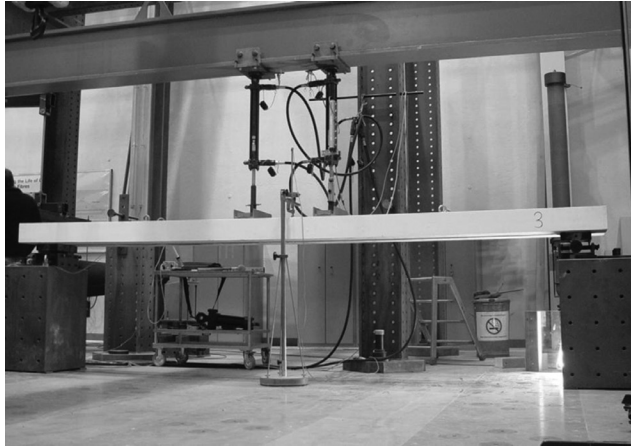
RC beam flexurally strengthened with a CFRP strip in the test setup. The test beam has a span of 4 m and is loaded under four-point bending (see Figure 14.6). (Photo courtesy of Empa, Dübendorf, Switzerland.)
